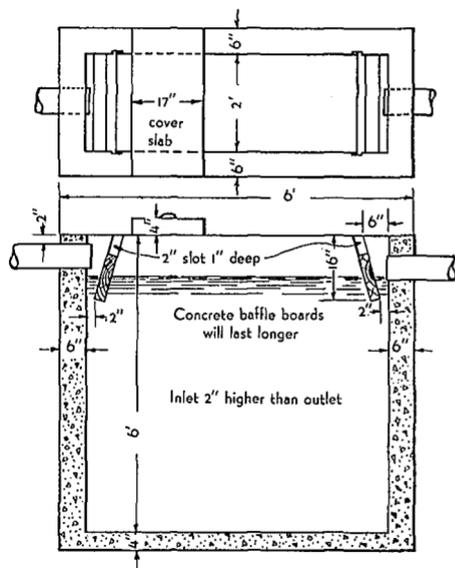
A Simple Concrete Tank Suitable Where the Velocity of Entering Sewage Is Not High and Where the Final Disposal Is into a Drainage Tile Line or Ditch. The Tank's Liquid Capacity Should Be About 8 Cubic Feet for Each Person.
